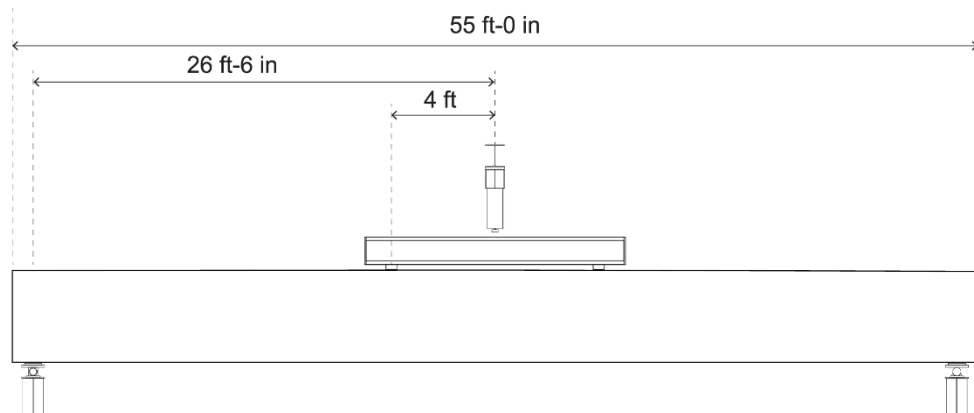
Flexural Testing Setup for the Aden Road Bridge Box Beams
